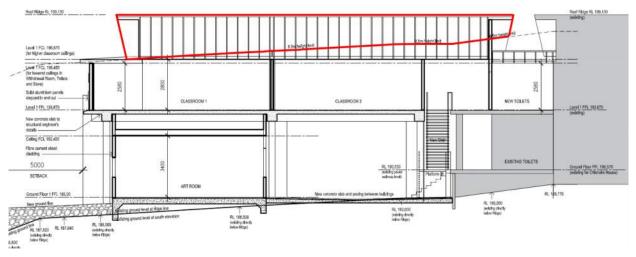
Extract of Section 1 showing Portion of the Building that Varies the Maximum Building Height (Source: Templum Design Architects)
